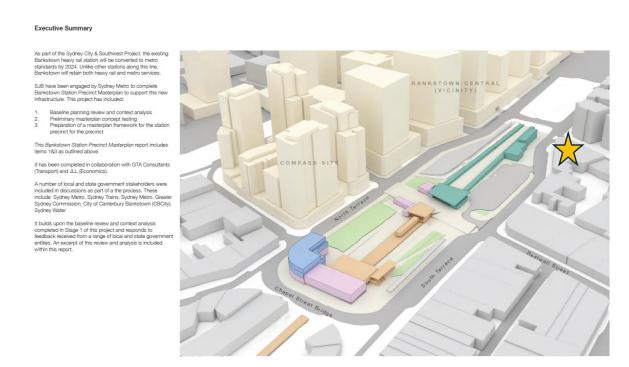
Metro concept masterplan indicates the uplift to the northern side of the station, however there is a significant opportunity to have similar density along South Terrace (Source: Metro concept masterplan).
